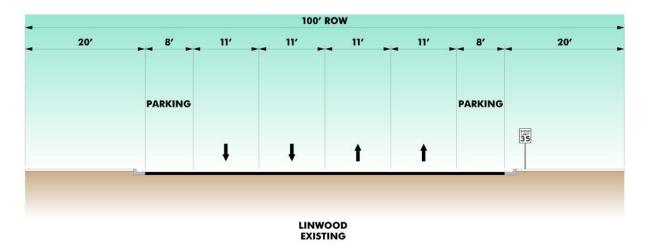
Bus Rapid Transit Linwood Blvd Typical Section, Existing Conditions
